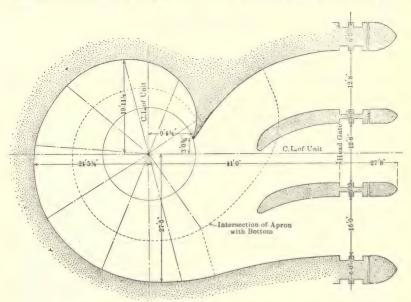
Sectional Plan of Cedar Rapids Wheel Chambers.
